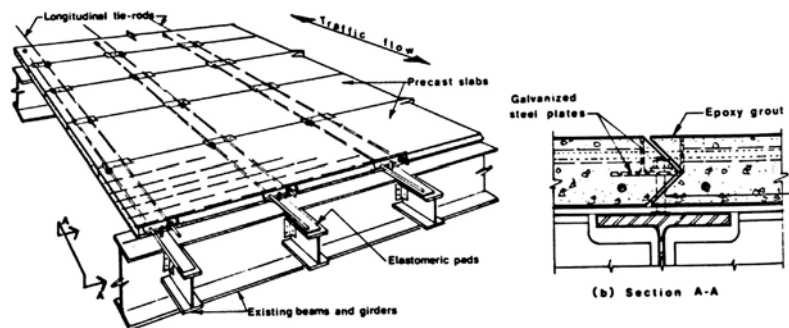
Details used at the Kingston Bridge, New York (Ref 9)
